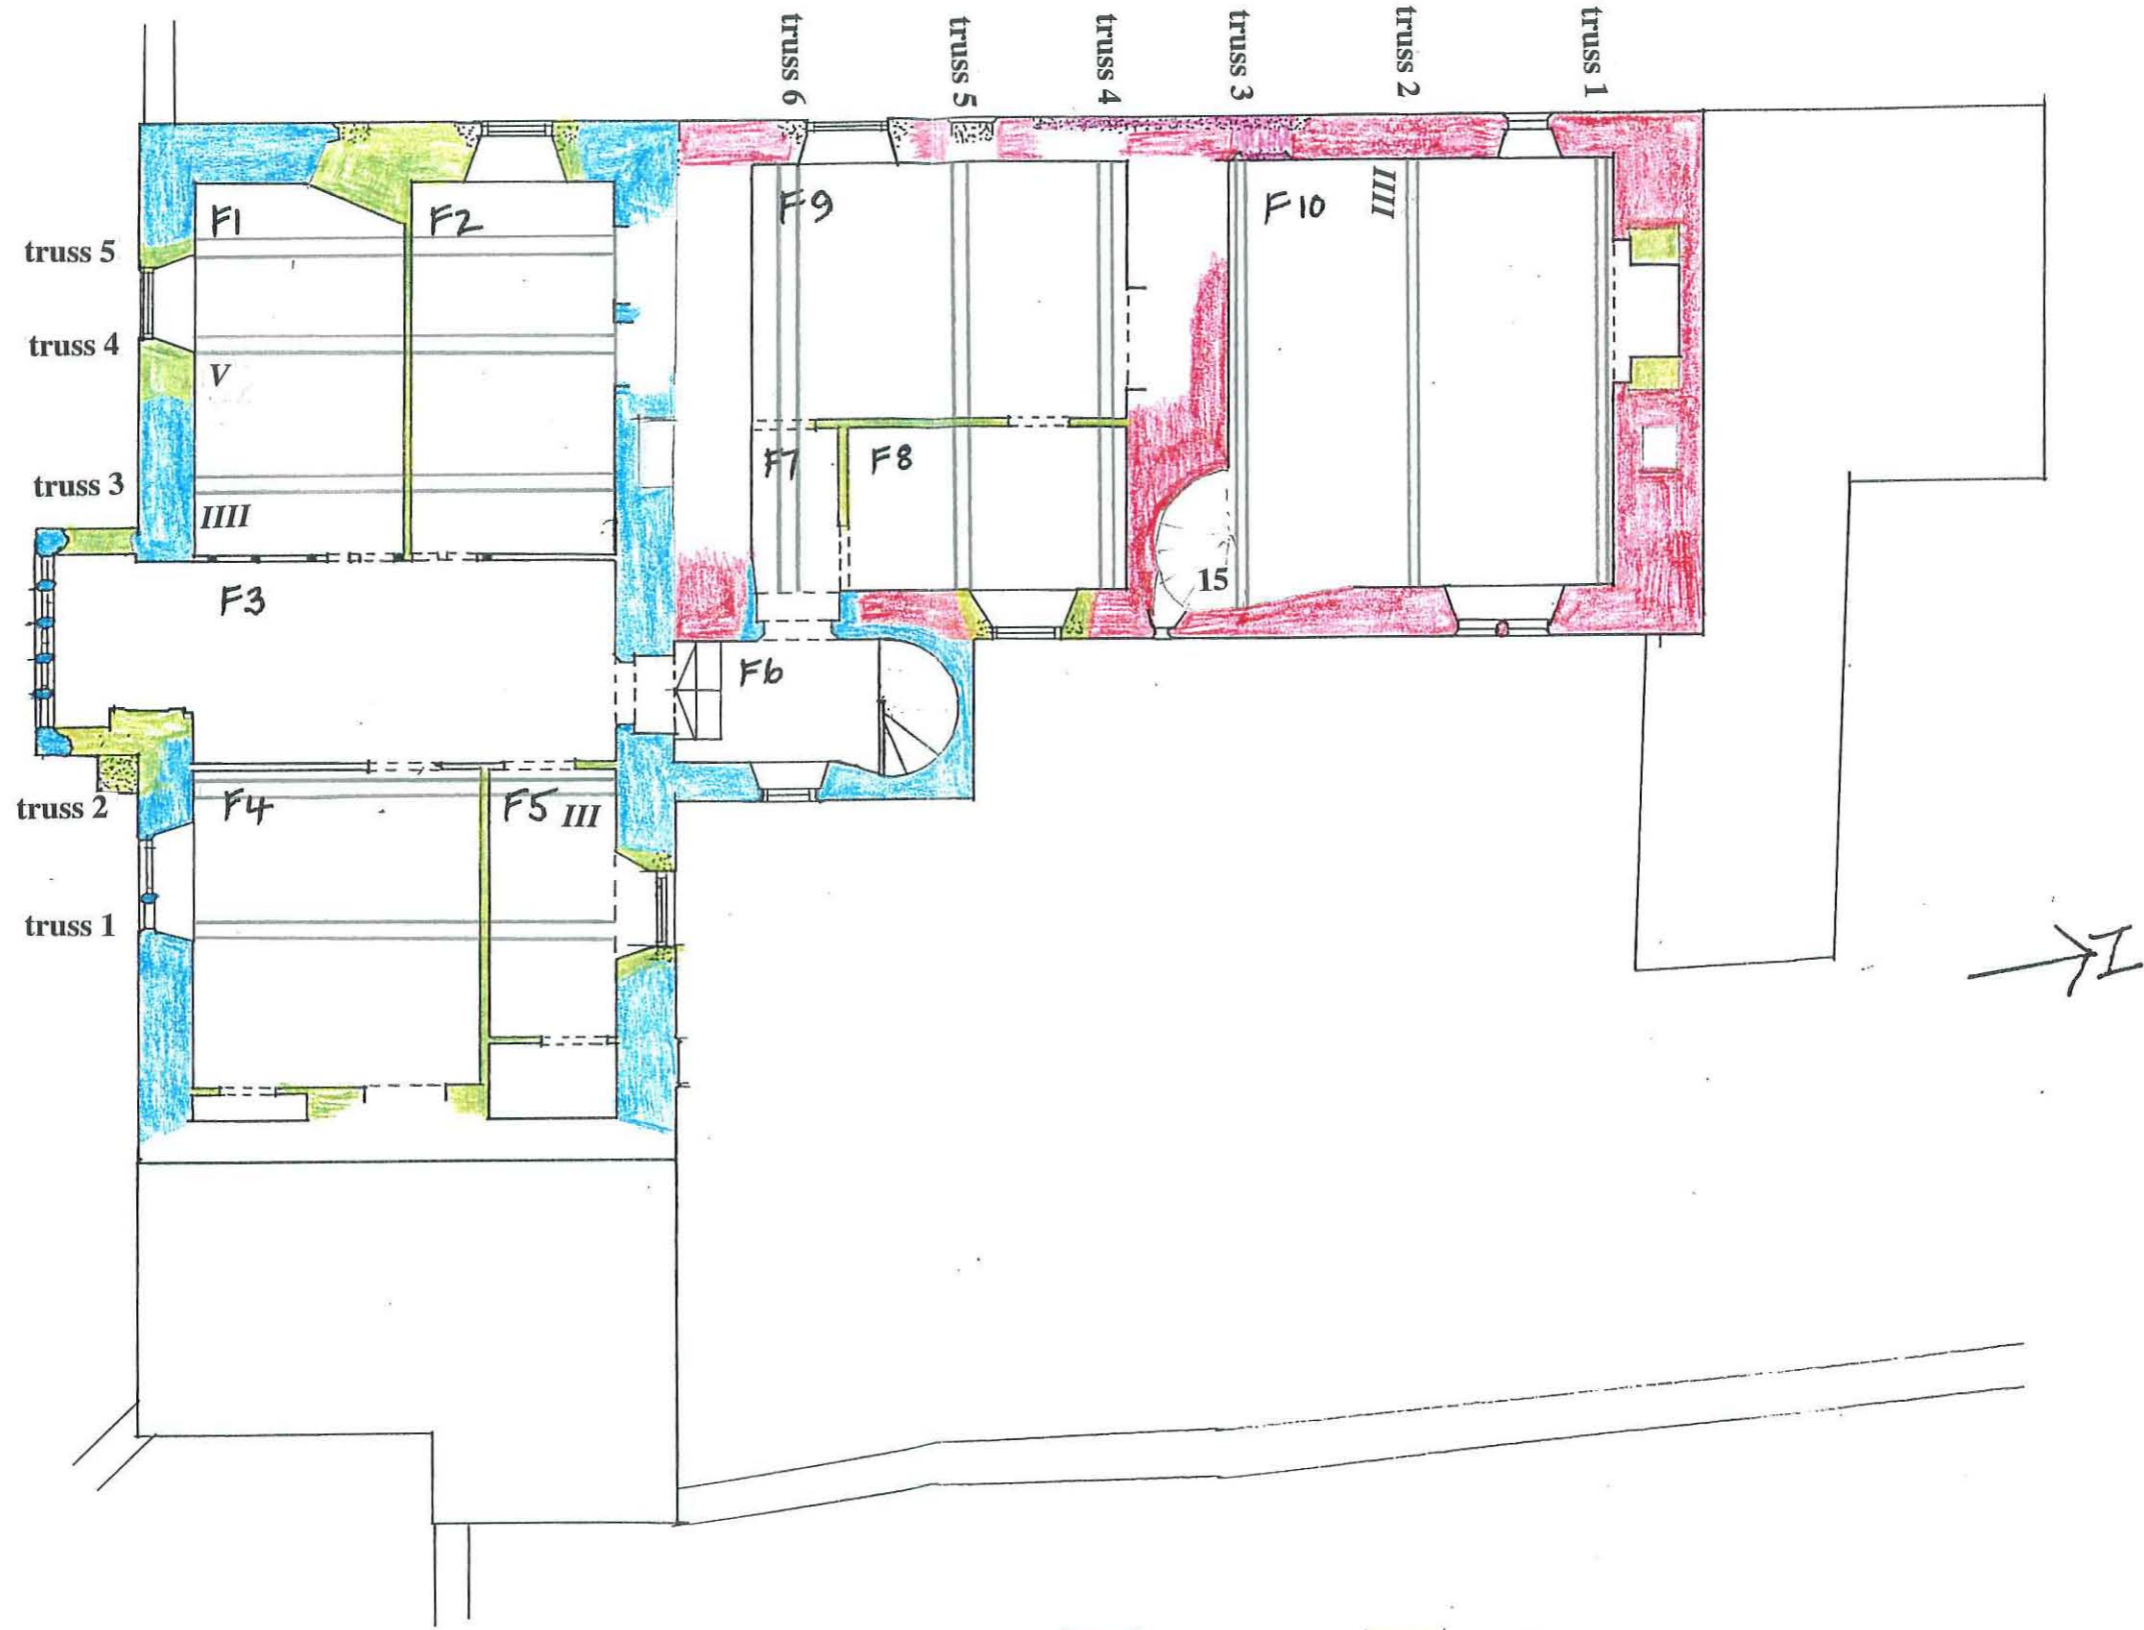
Plan of the ground floor showing phasing, position of trusses, and position of sample STN-B14
